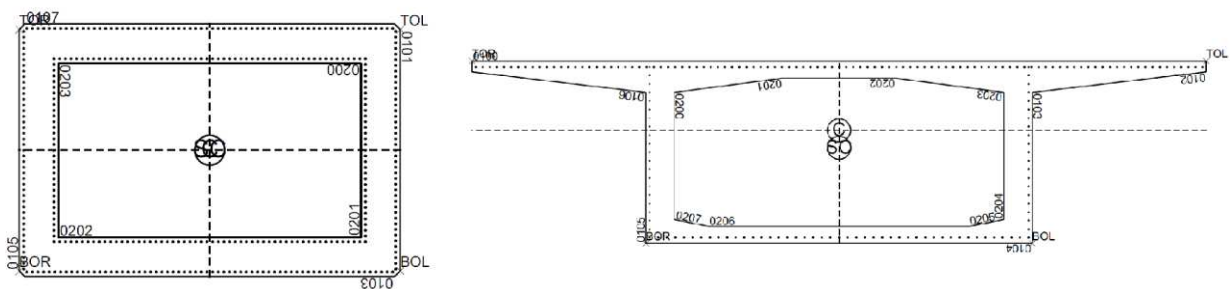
Example of generated cross sections: pier (left) and superstructure (right)
